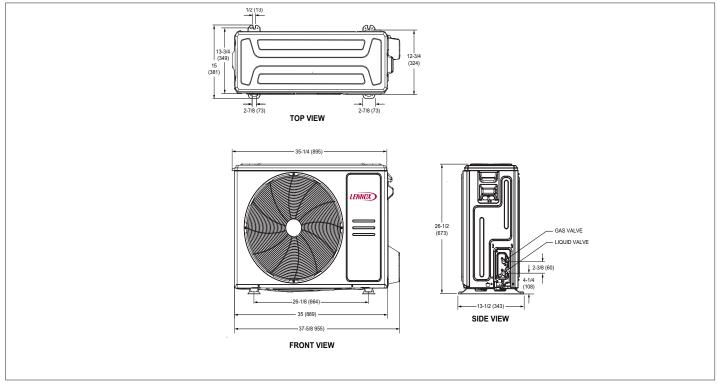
MPC018S4S Outdoor Unit Dimensions - Inches (mm)
